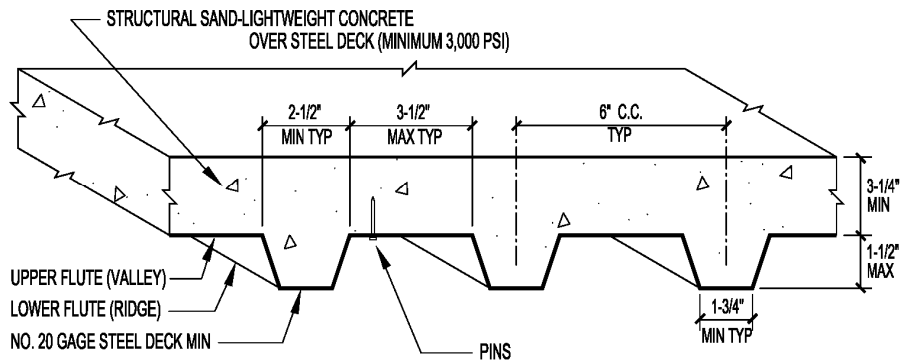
B—FASTENER INSTALLATION IN UPPER FLUTES OF 1 1/2-INCH-DEEP STEEL DECK PROFILES
